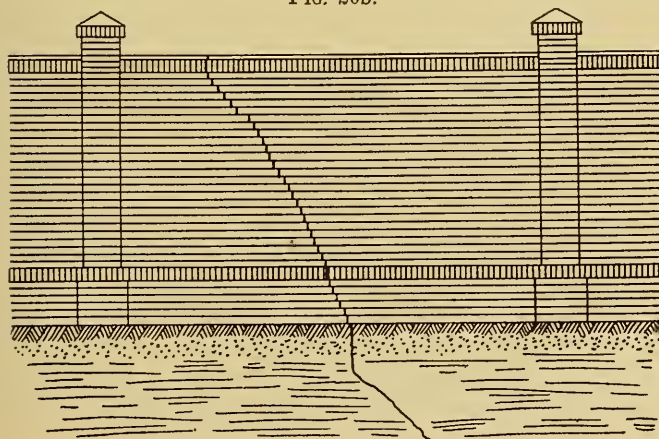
CRACKS IN LONG WALLS.
